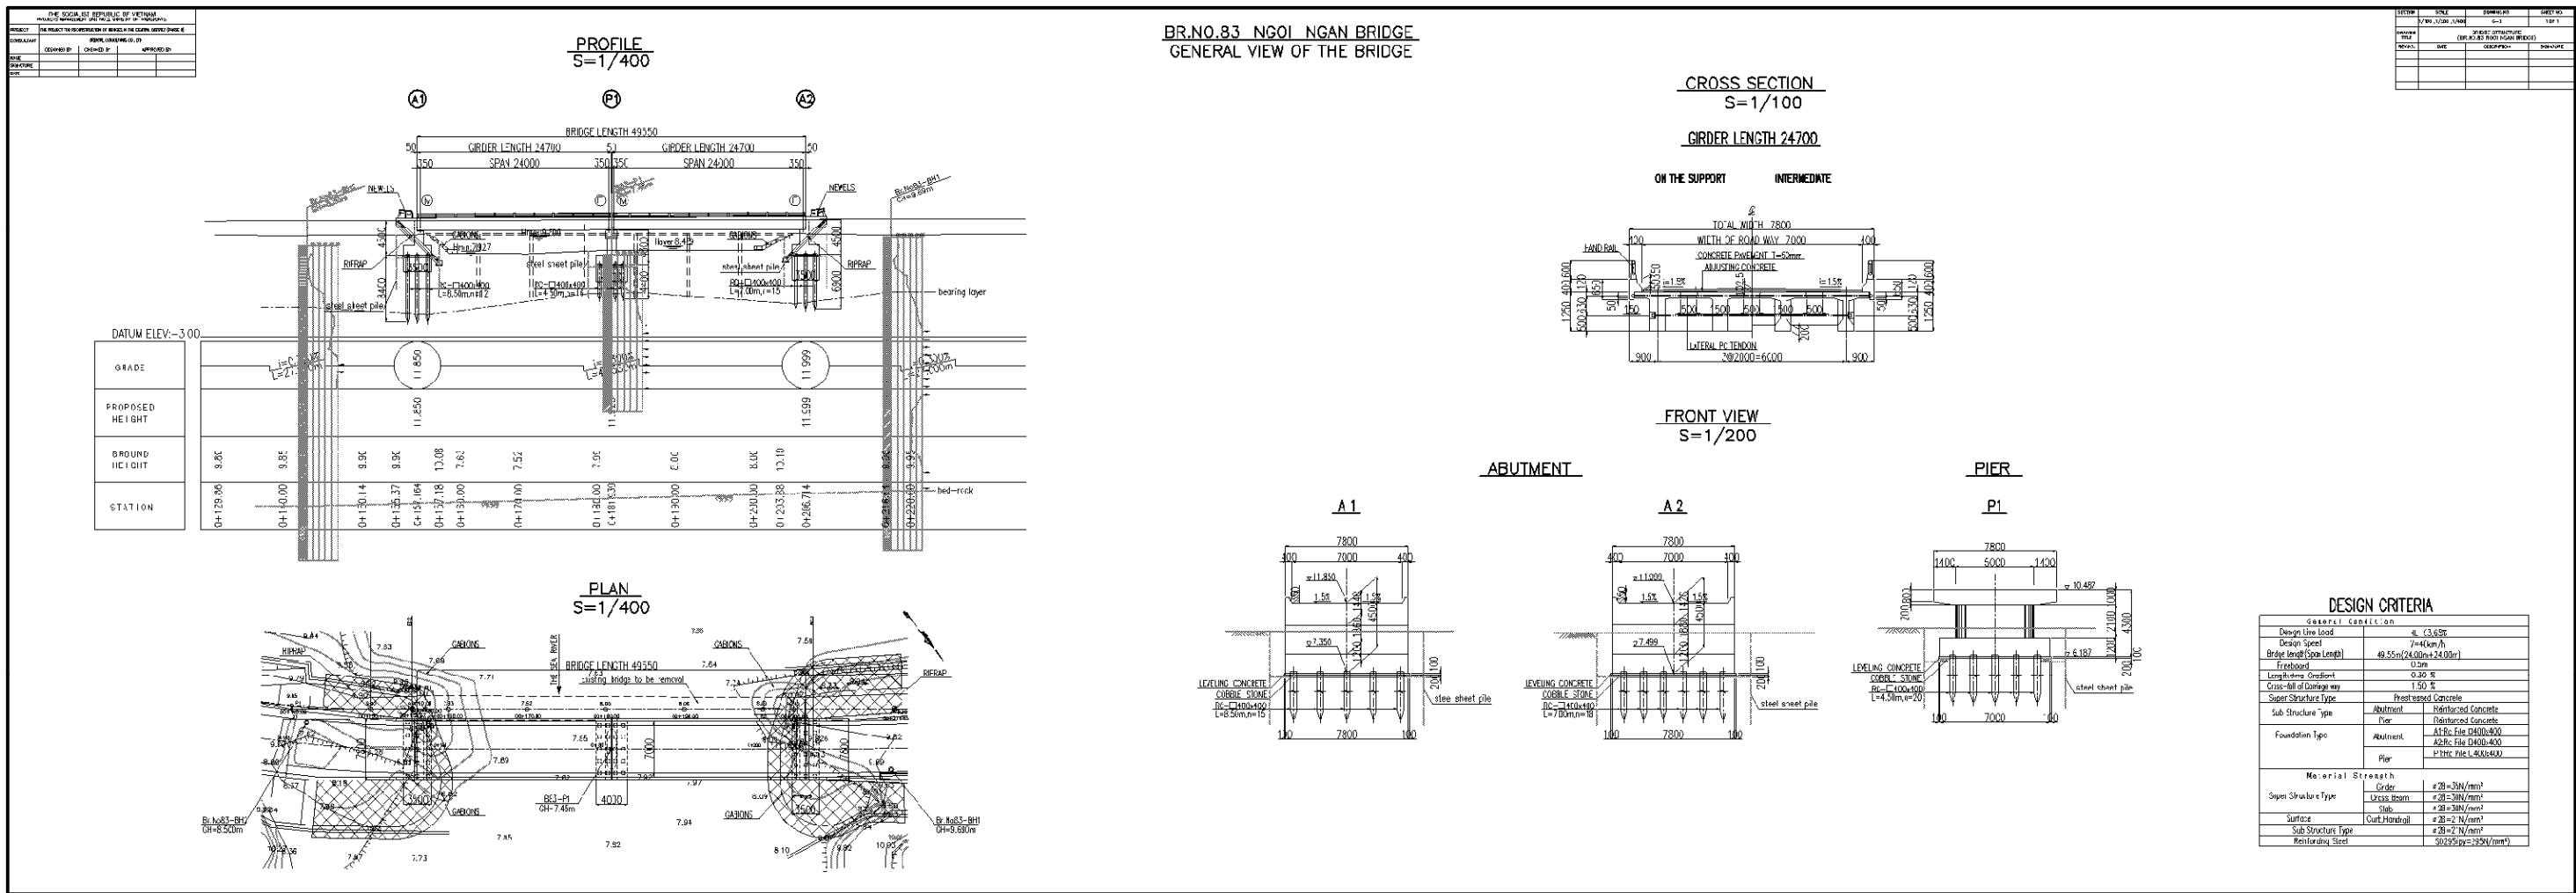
Nghi Ngan Bridge (General View for Structure)
